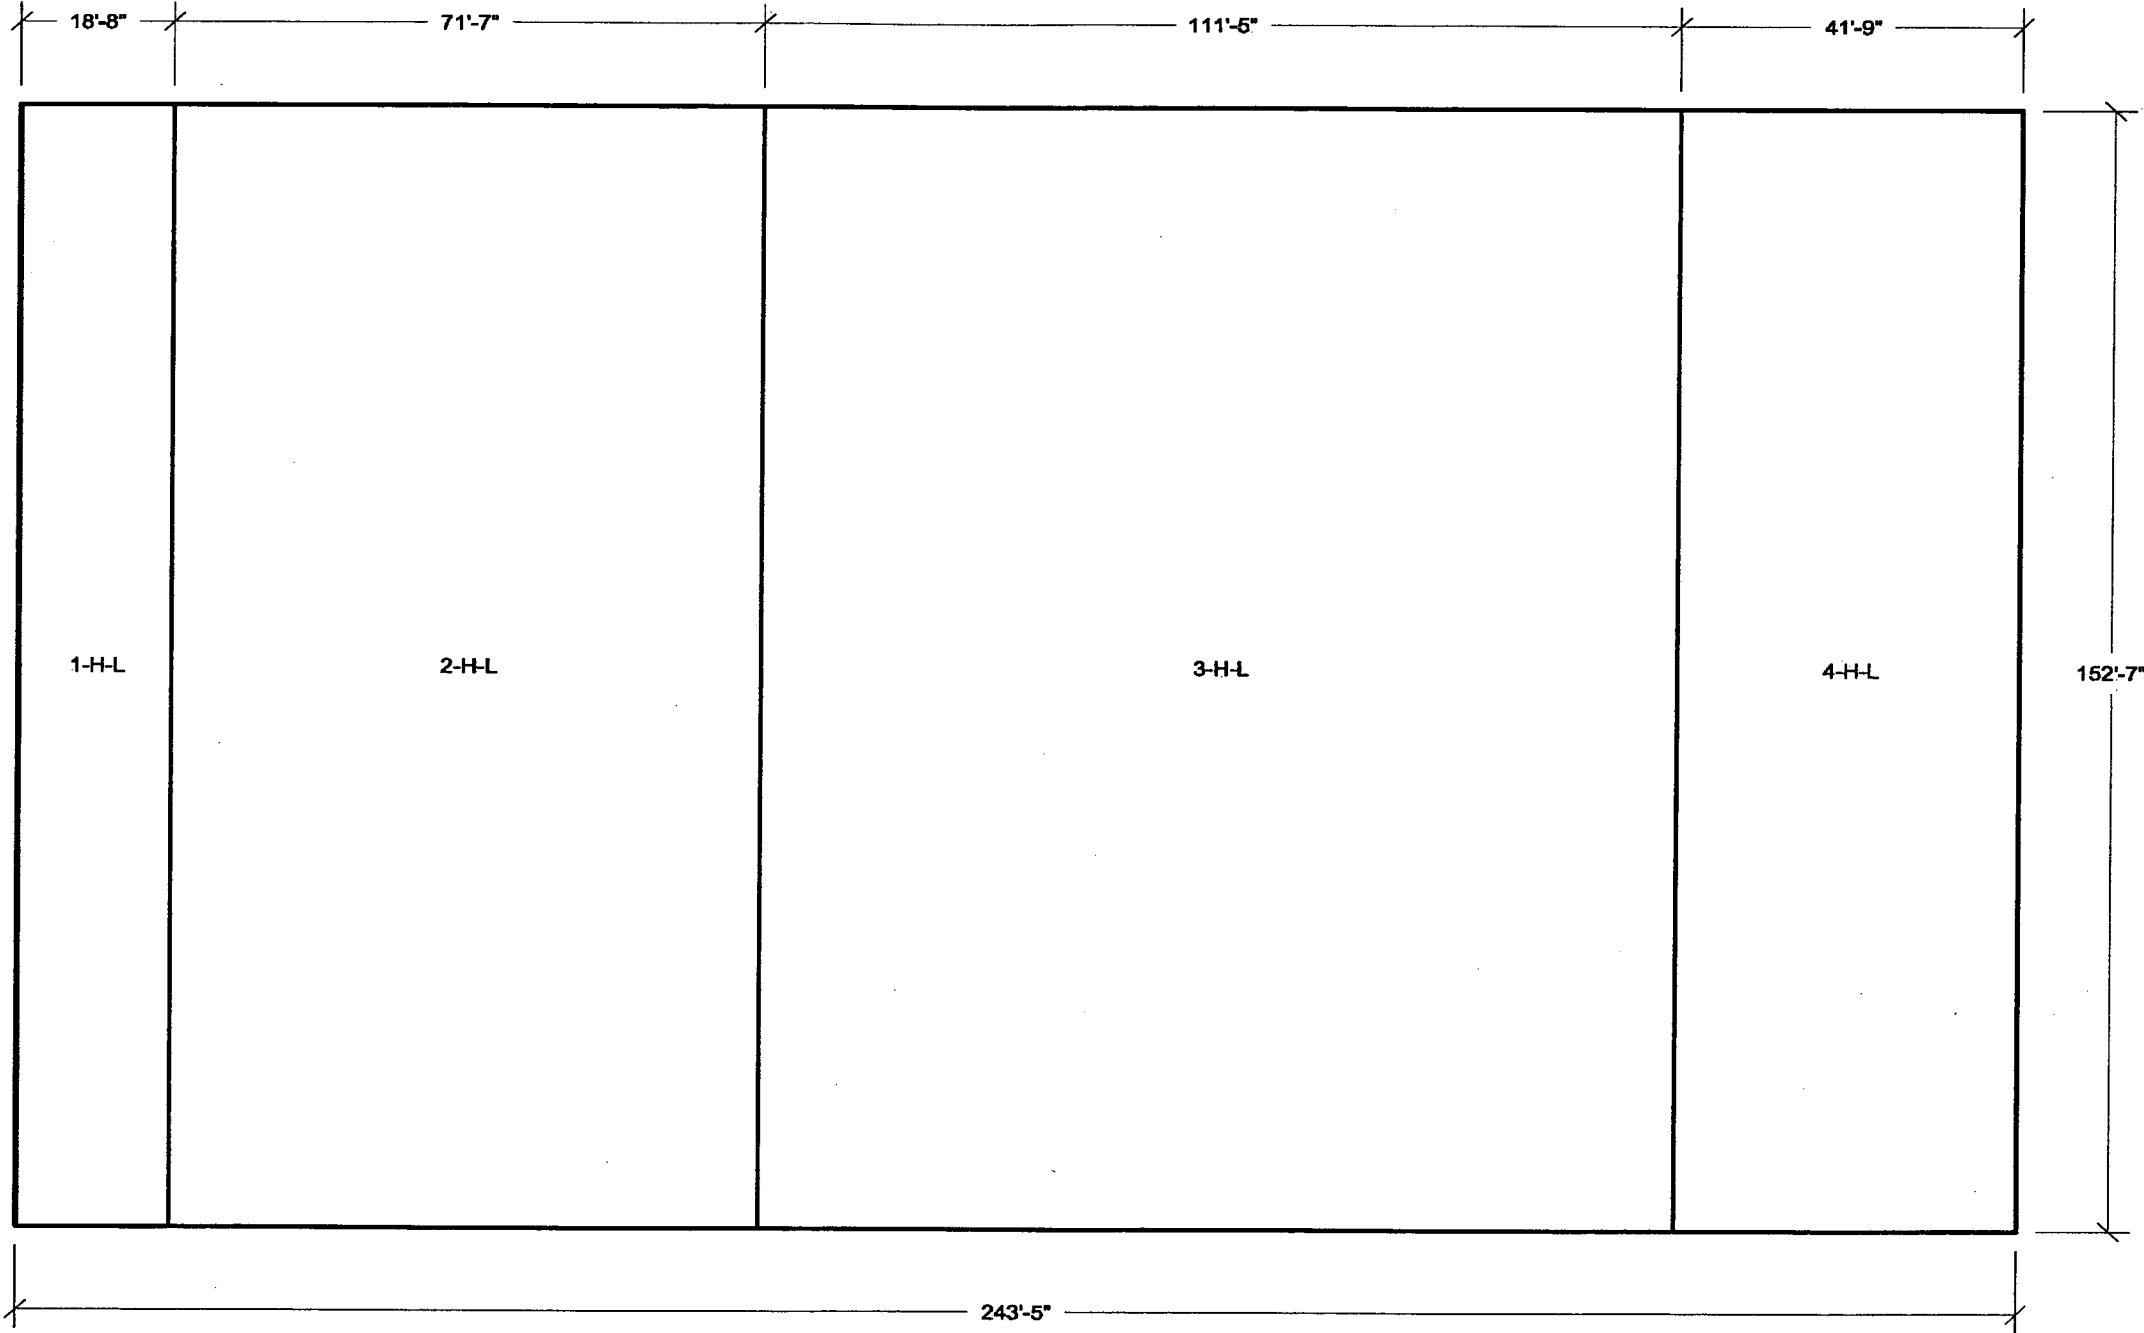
H.3-27: WEST WALL LOOKING EAST
